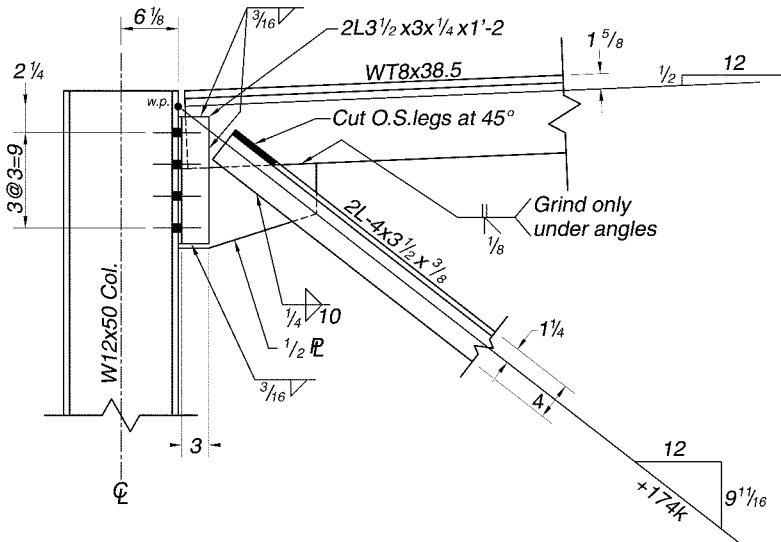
Truss support connection, working point (w.p.) on column face.
